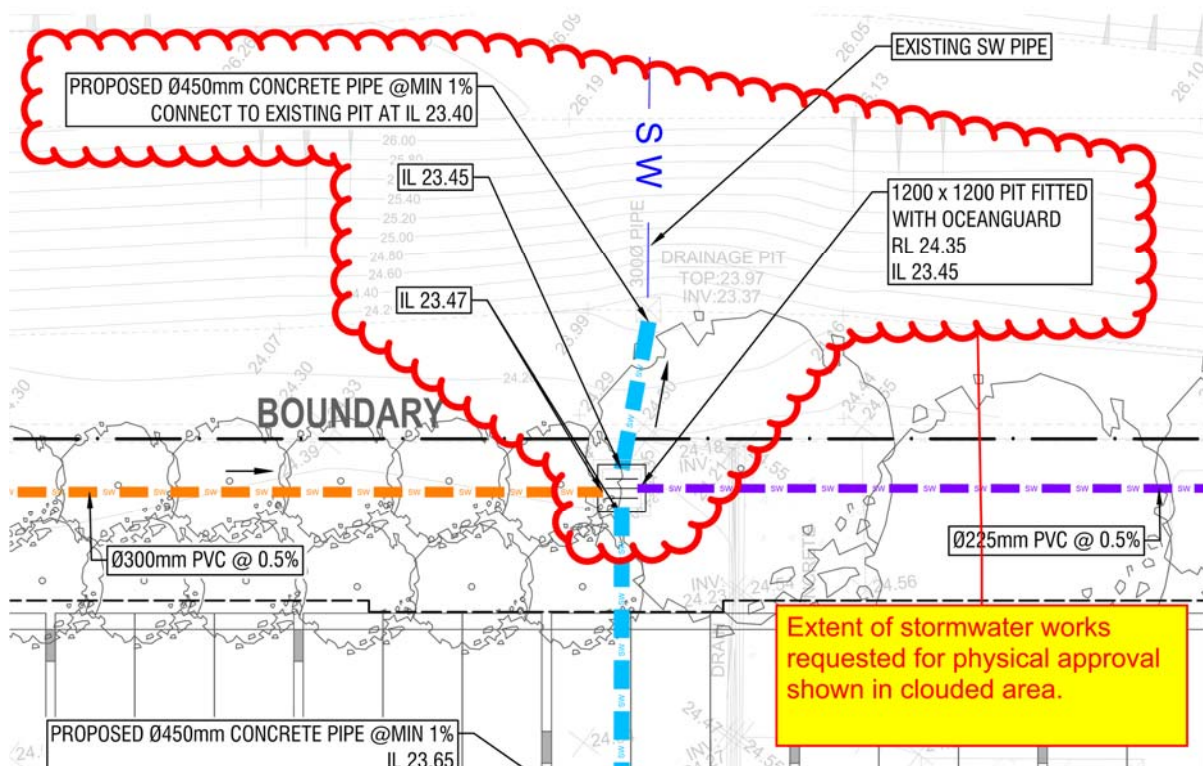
Extract from Stormwater Drawings – Ground Level, Lot 16.
